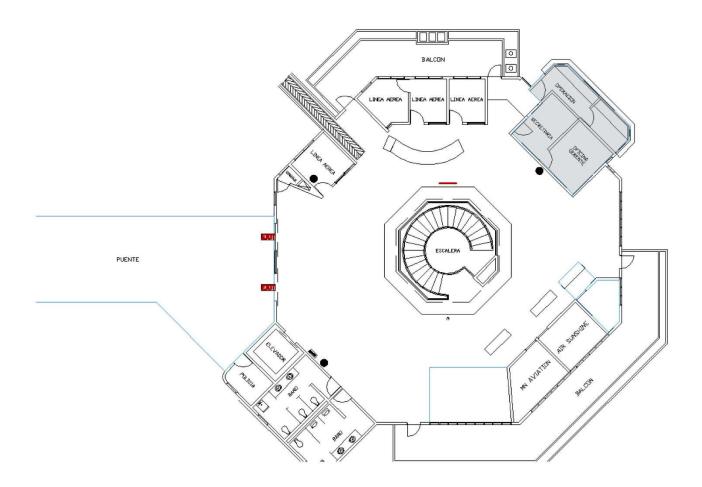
TERMINAL LAYOUT PLAN LEVEL 2
